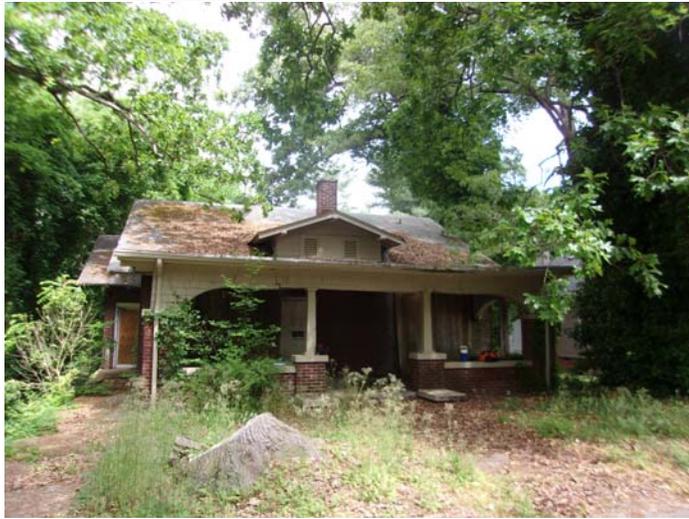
342 Ridgewood Avenue in Spartanburg, South Carolina
